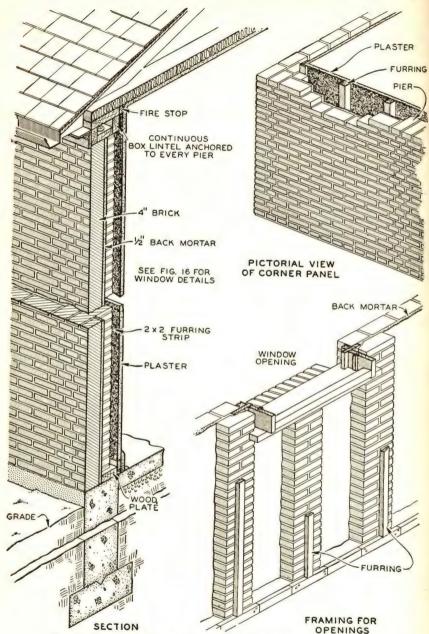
Pictorial View of Pier and Panel Wall with Typical Details
